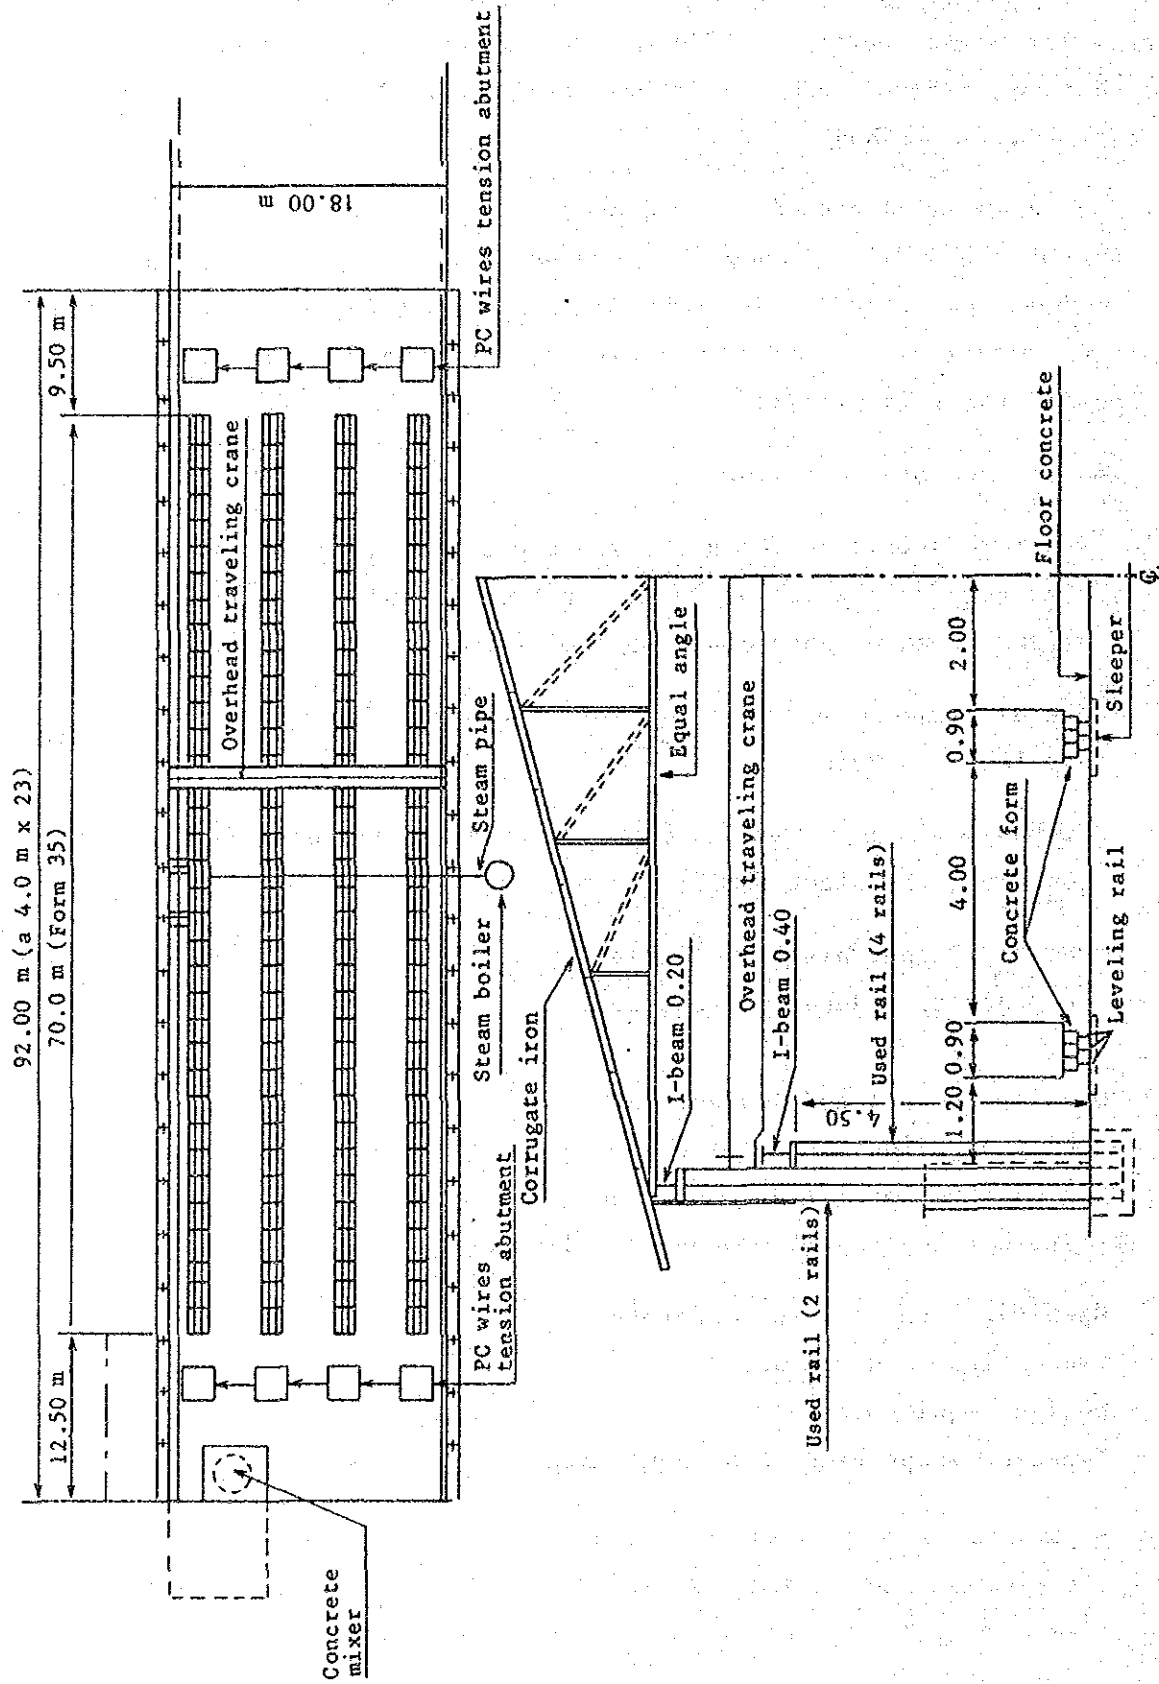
Typical PC Sleeper Factory (Prevention) Layout
